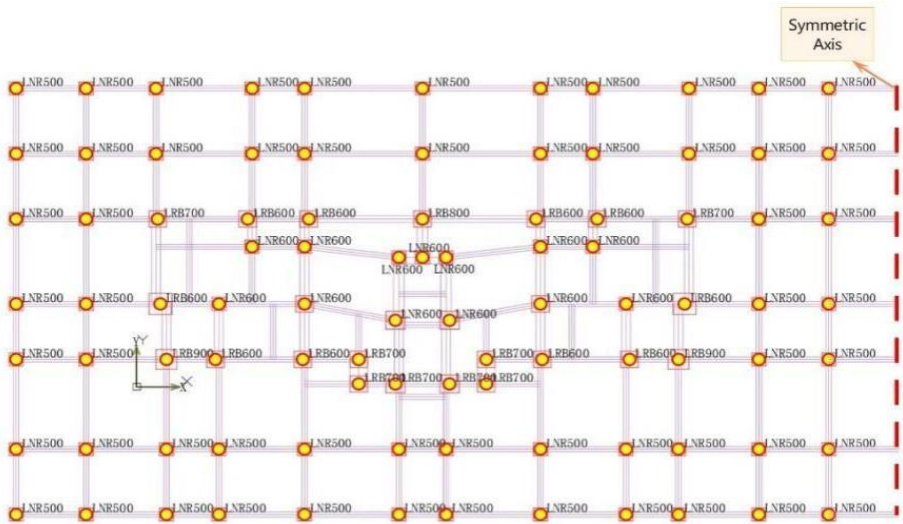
The details of layouts for isolation layer at the bottom of Model 2 (half plan view) [26]
